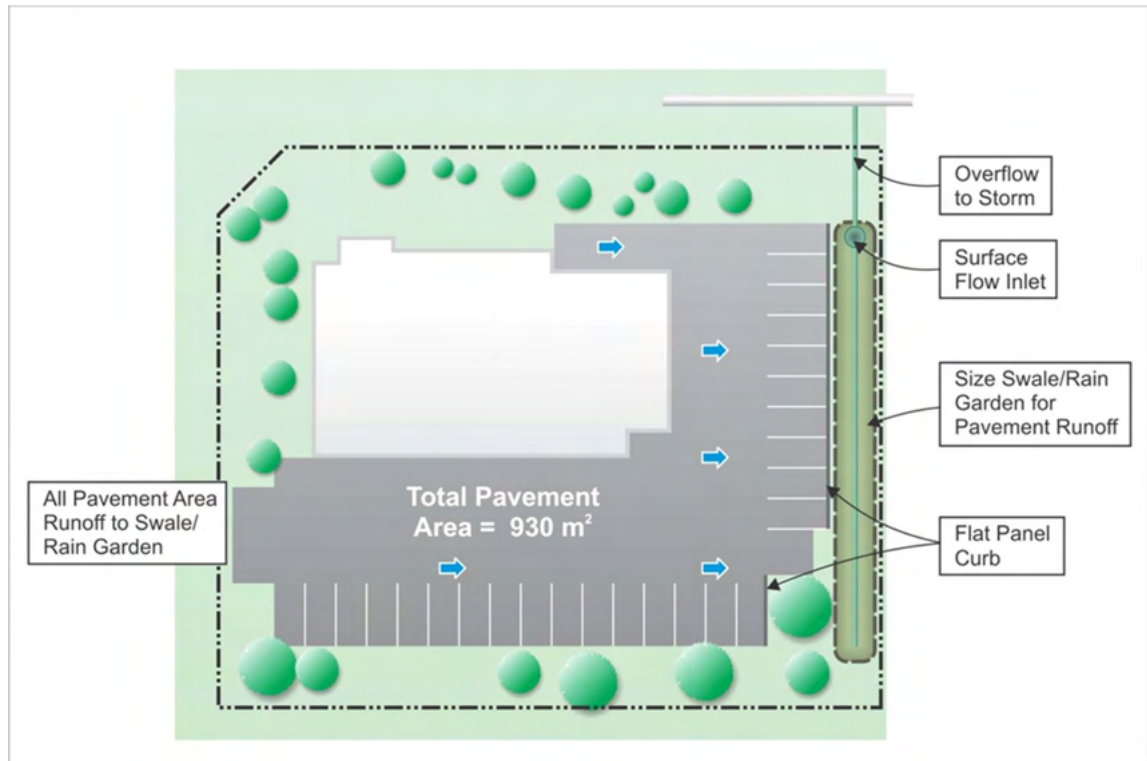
Example – Parking Area Draining to Infiltration Swale
